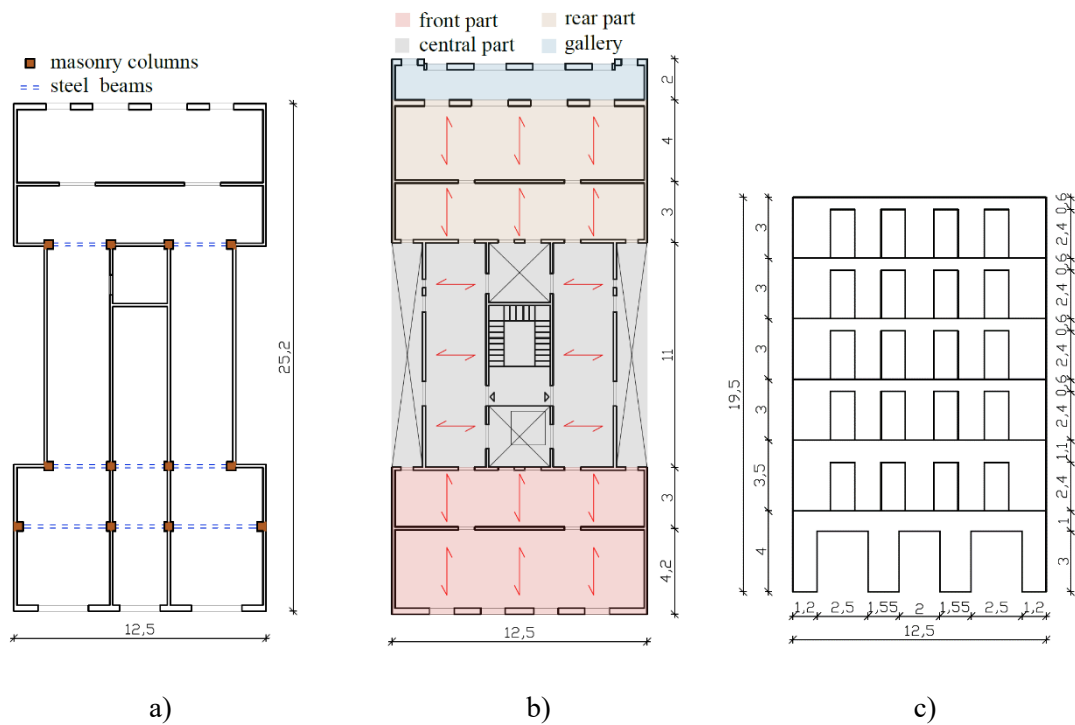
Floor plan of two typical Eixample buildings illustrating the direction of the floor beams [27].
